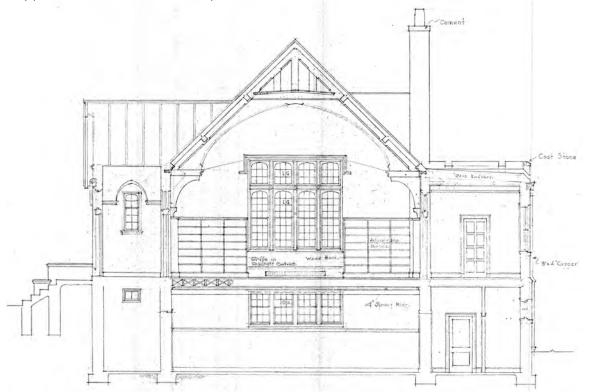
section as designed by Stratton. Note the vaulted ceilings with prominent trusses and brackets. The bookshelves along the gable wall have been removed.
